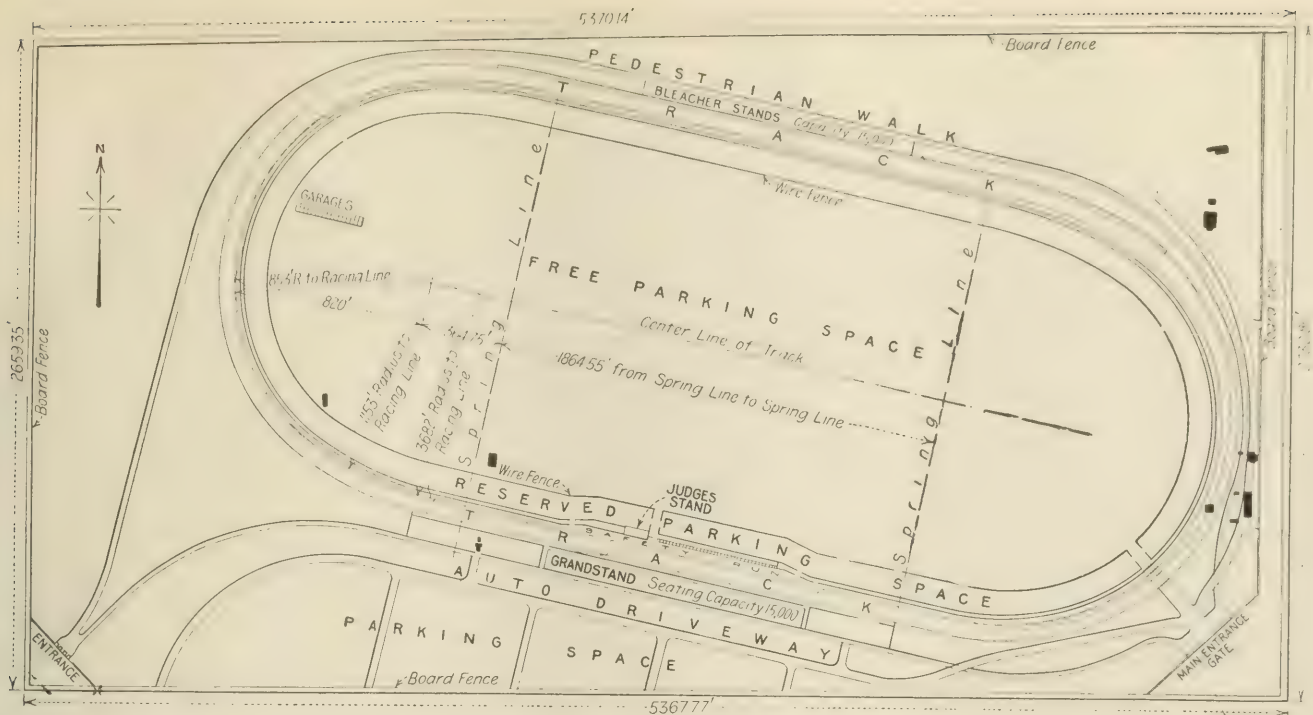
PLAN OF CINCINNATI MOTOR RACETRACK, SHOWING ELEMENTS OF ALIGNMENT
